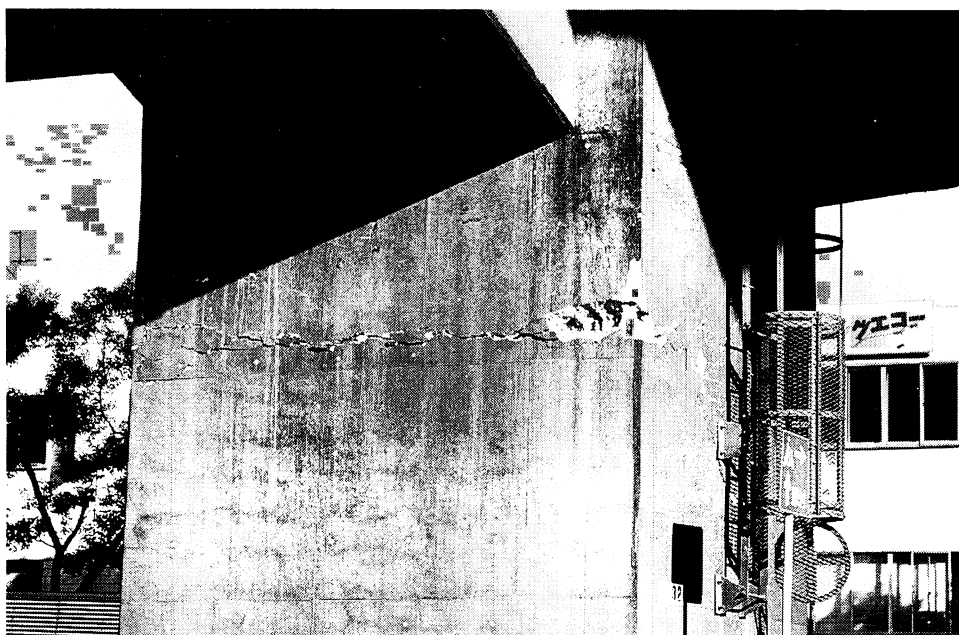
Tensile failure mode due to impulsive force in a bridge R/C pier
